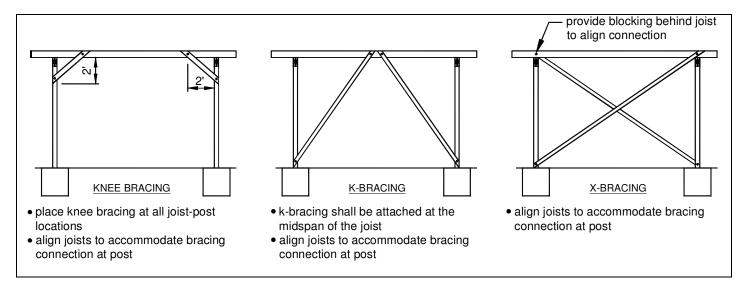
DIAGONAL BRACING AT JOISTS-POST LOCATIONS (free-standing decks only)
